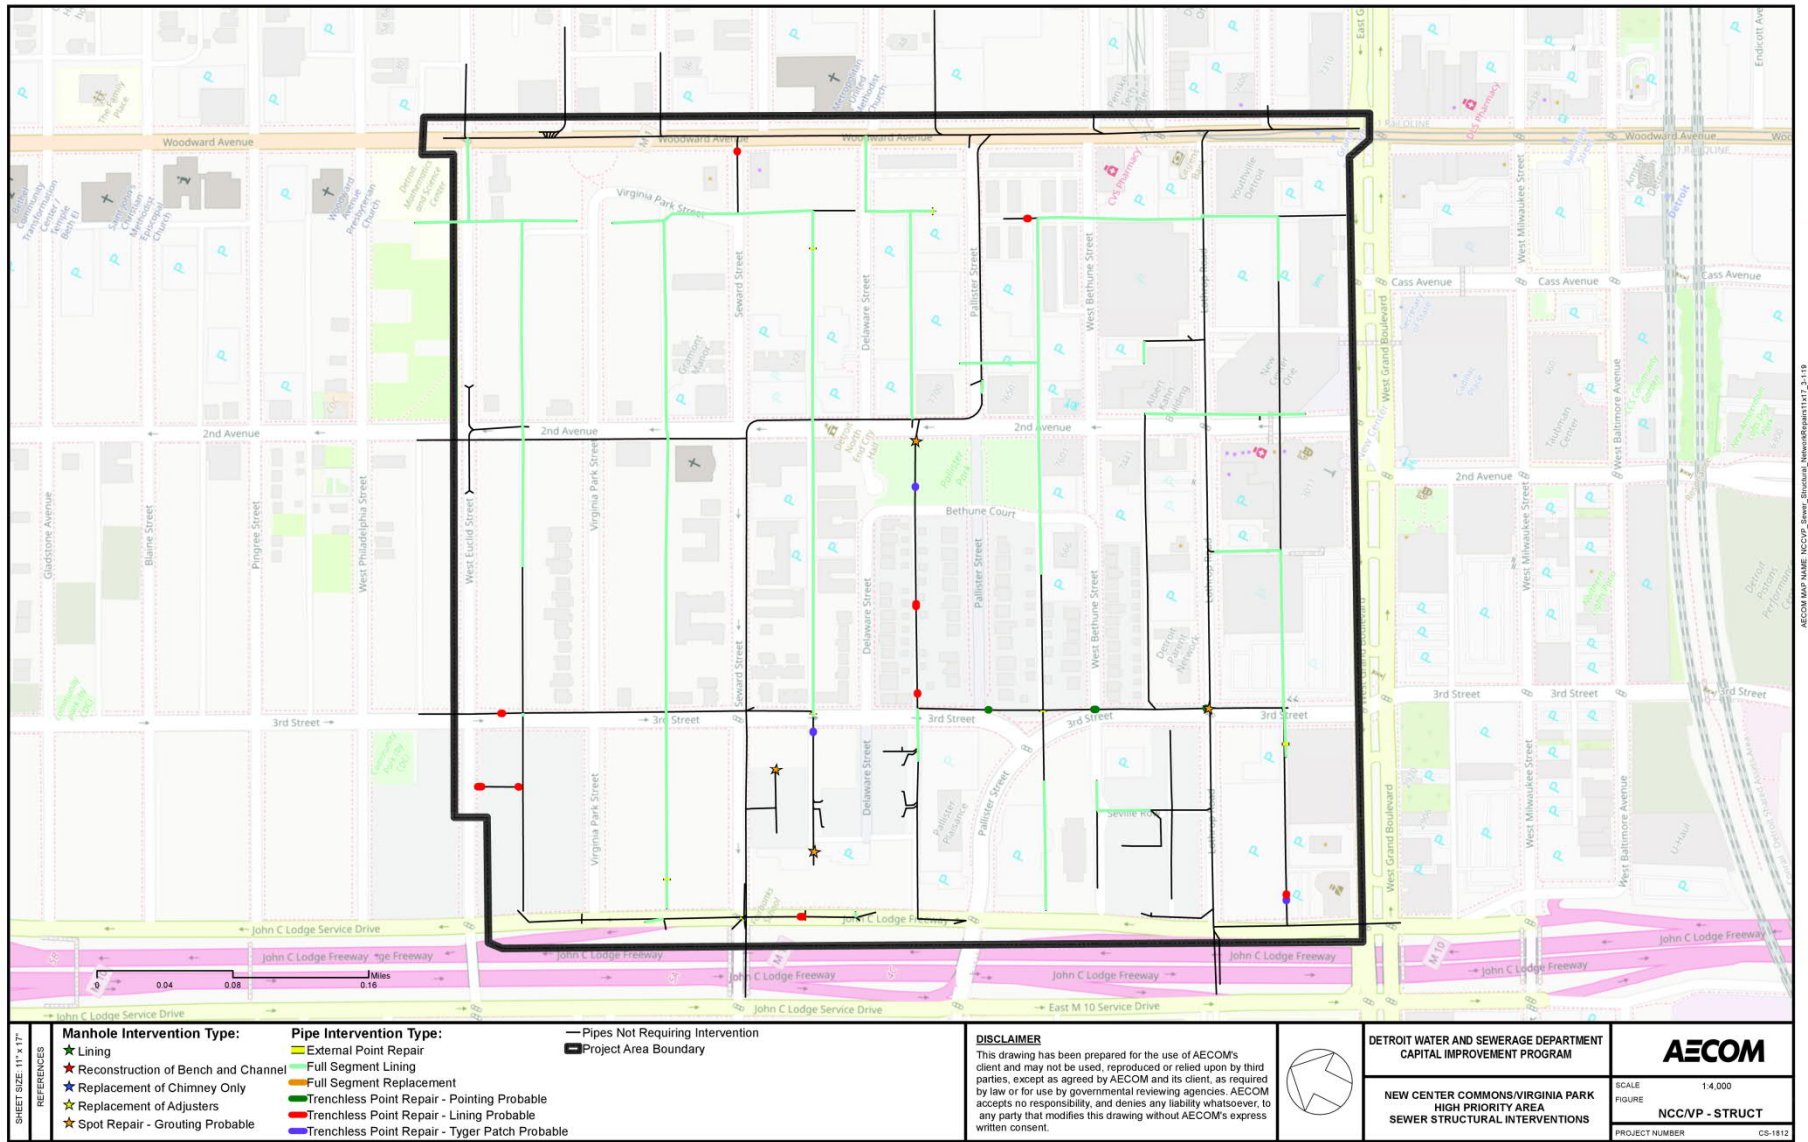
New Common Center/Virginia Park Sewer Structural Repairs
